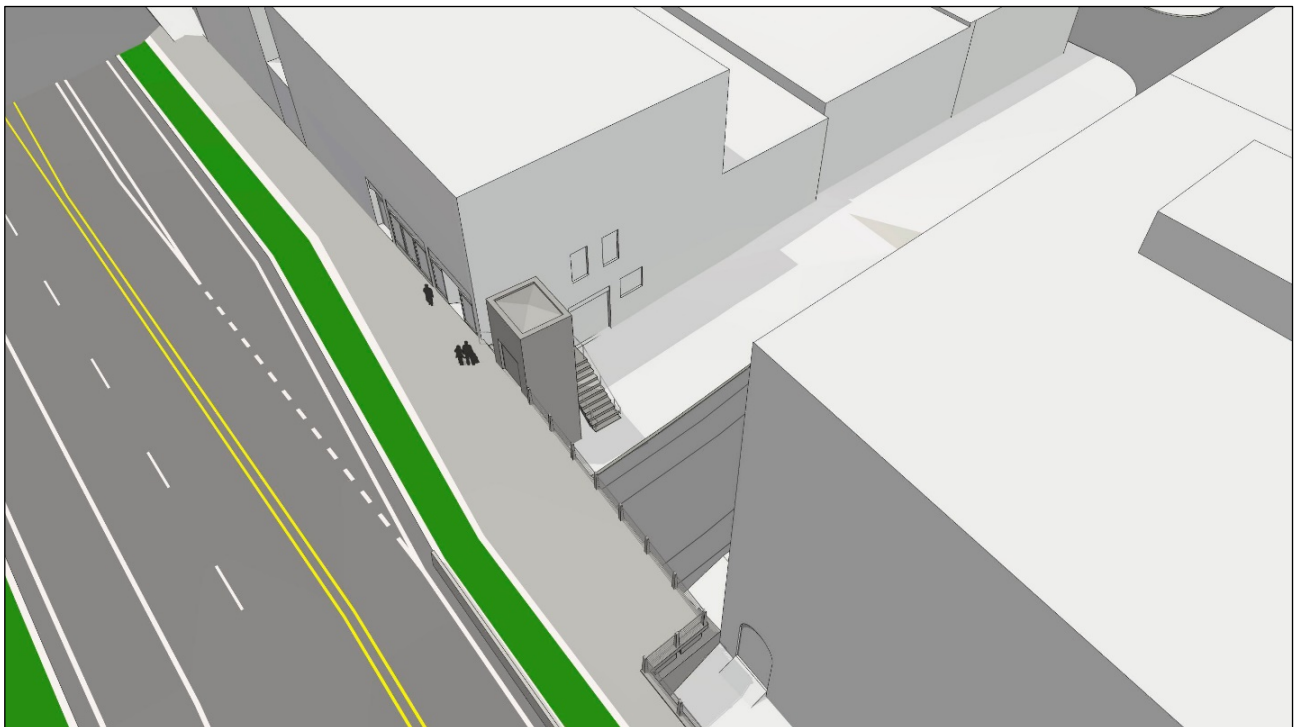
Proposed new pedestrian access at north side of west approach, artist's rendering, aerial view looking northwest (Fat Pencil Studio, 2021).
